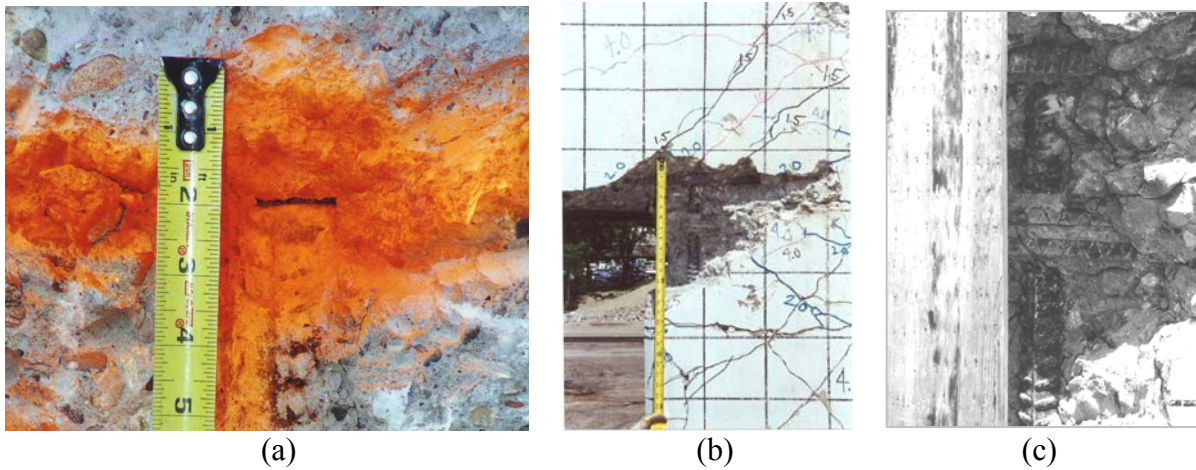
Damage to Bent #5S (2000) at top of center column: (a) pullout of longitudinal reinforcement, (b) after test, (c) showing buckled column bar
